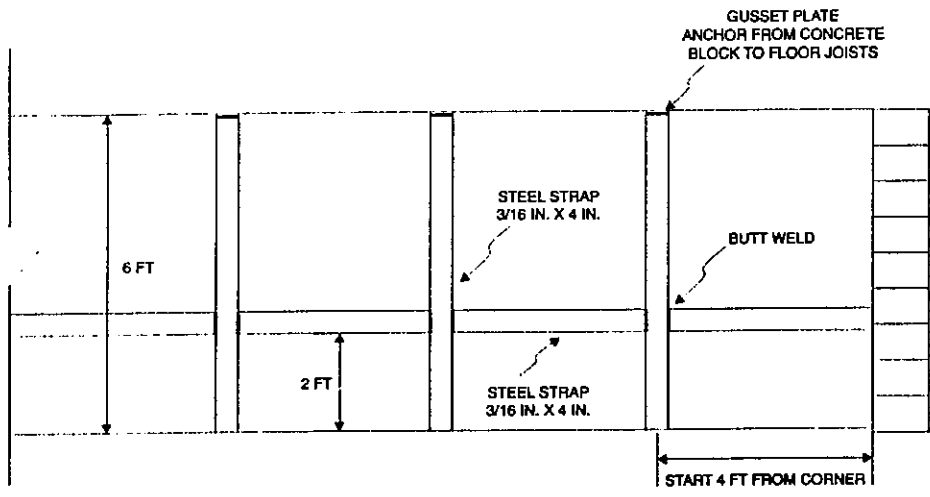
GENERAL STRAP RETROFIT LAYOUT FOR SUPPORT OF BLOCK BASEMENT WALLS - STREATOR, ILLINOIS
